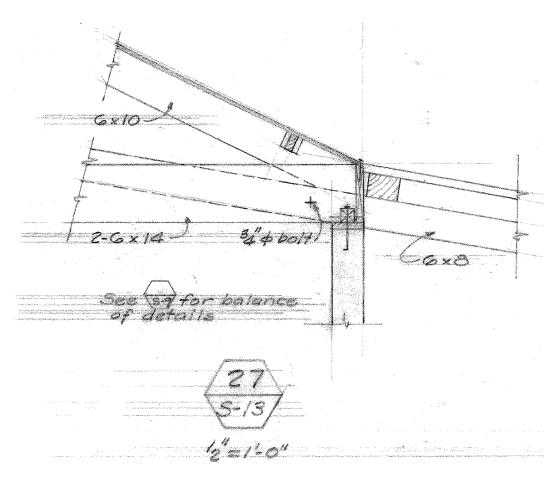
Detail 27/S13 - Roof Diaphragm to Wall Connection
